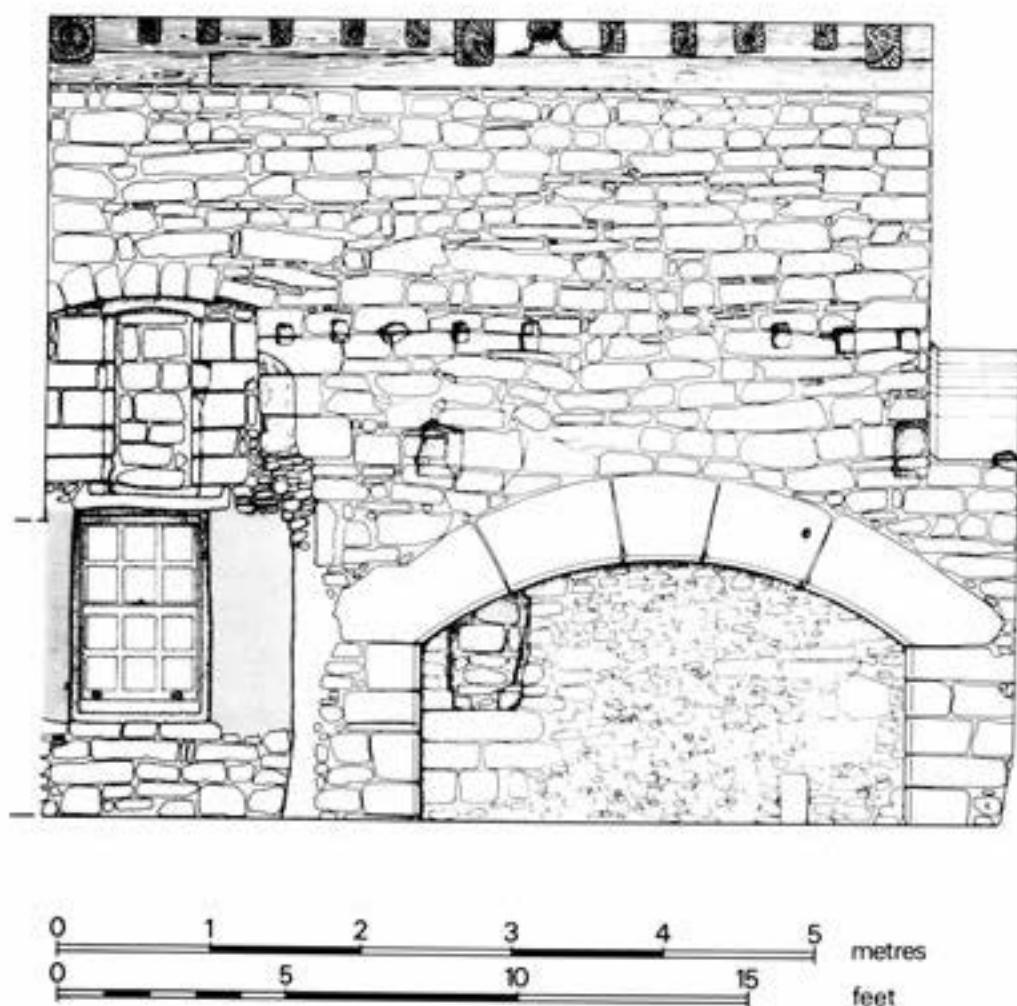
The outer gatehouse; internal east-west elevation of the south wall of the kitchen (room 11)
